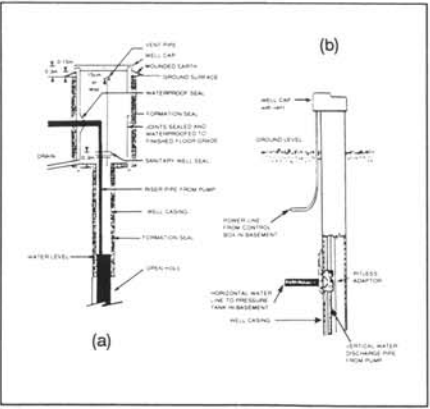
(a) Well Pit Construction (b) Pitless Adaptor
